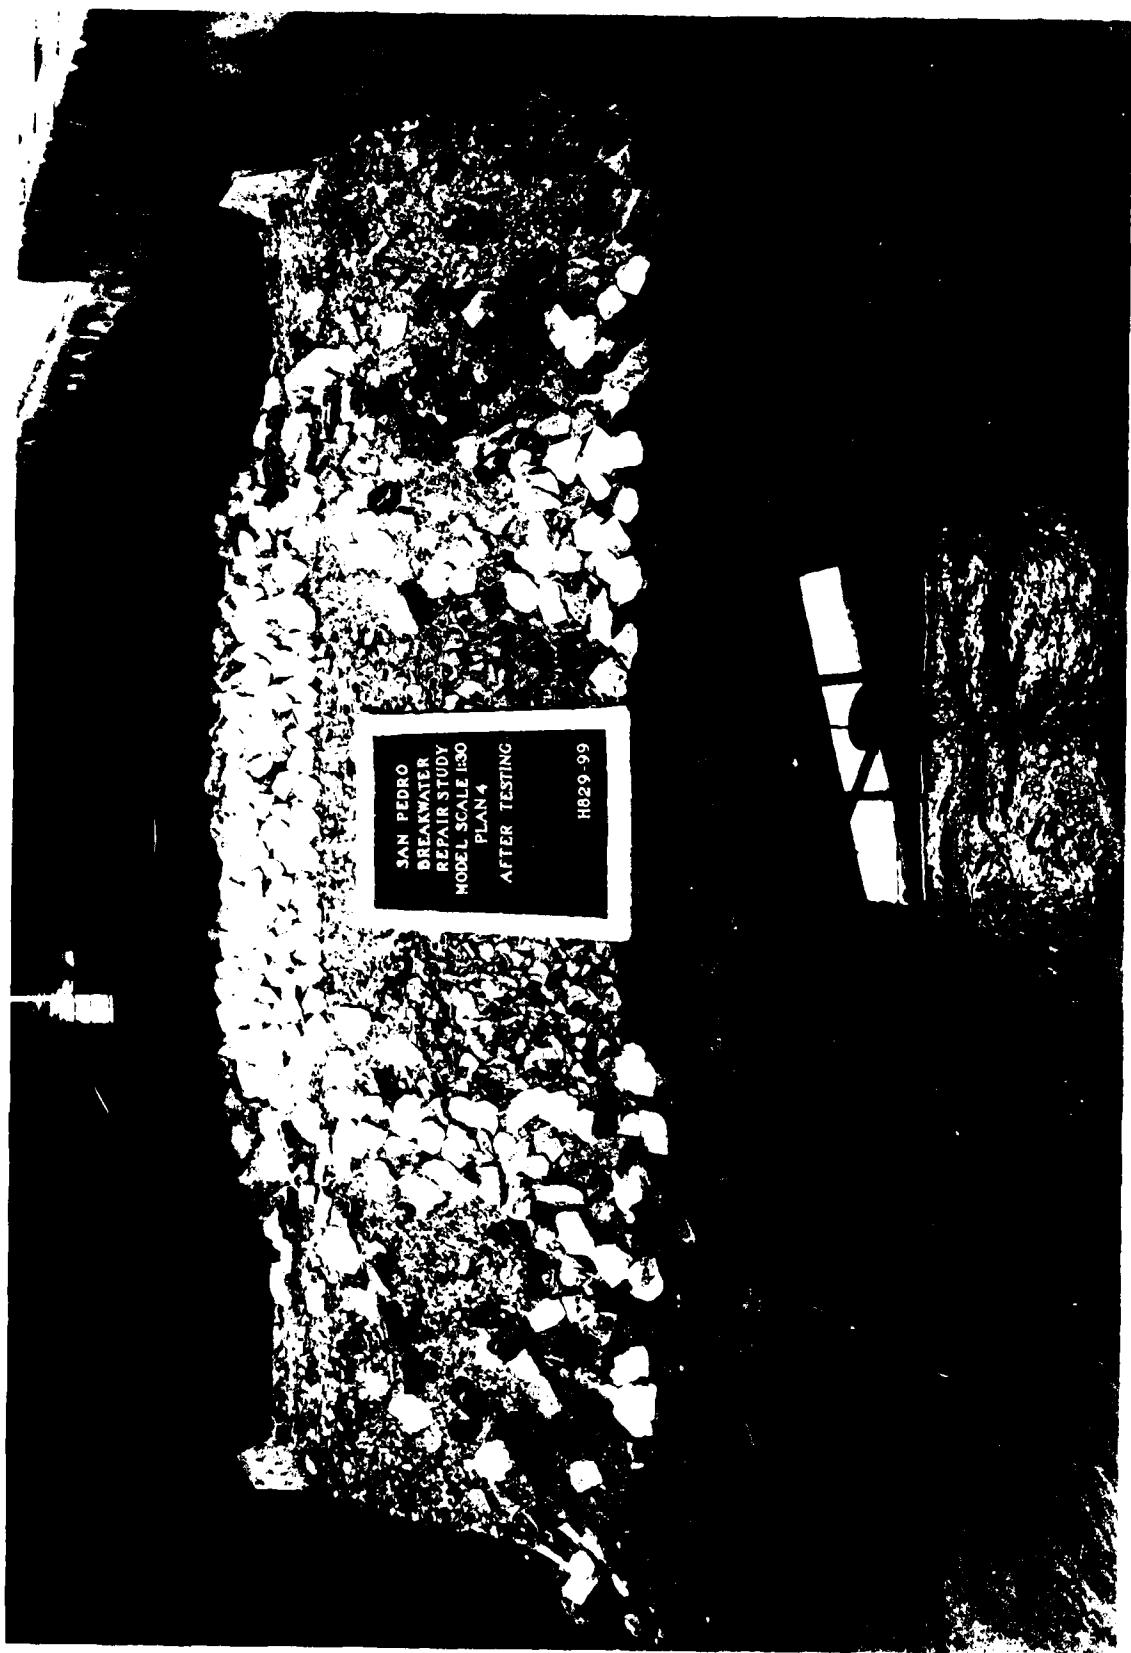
Harbor-side view of Plan 4 after subjection to Hydrograph B.
